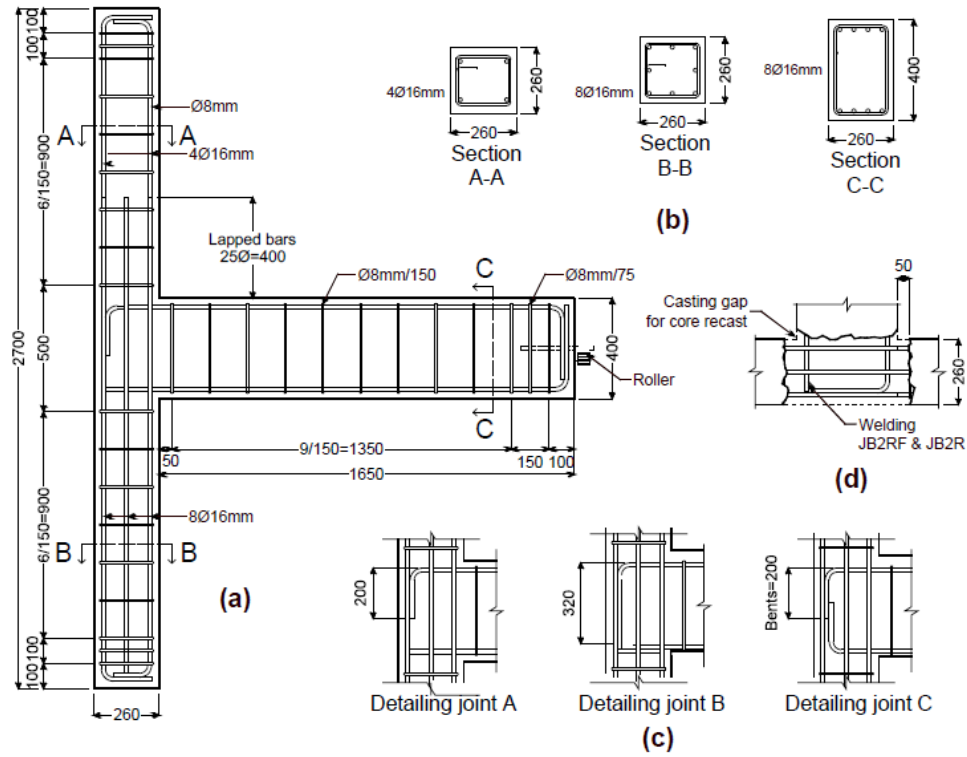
Reinforcement detail for bare specimens (Jemaa et al., 2013)
